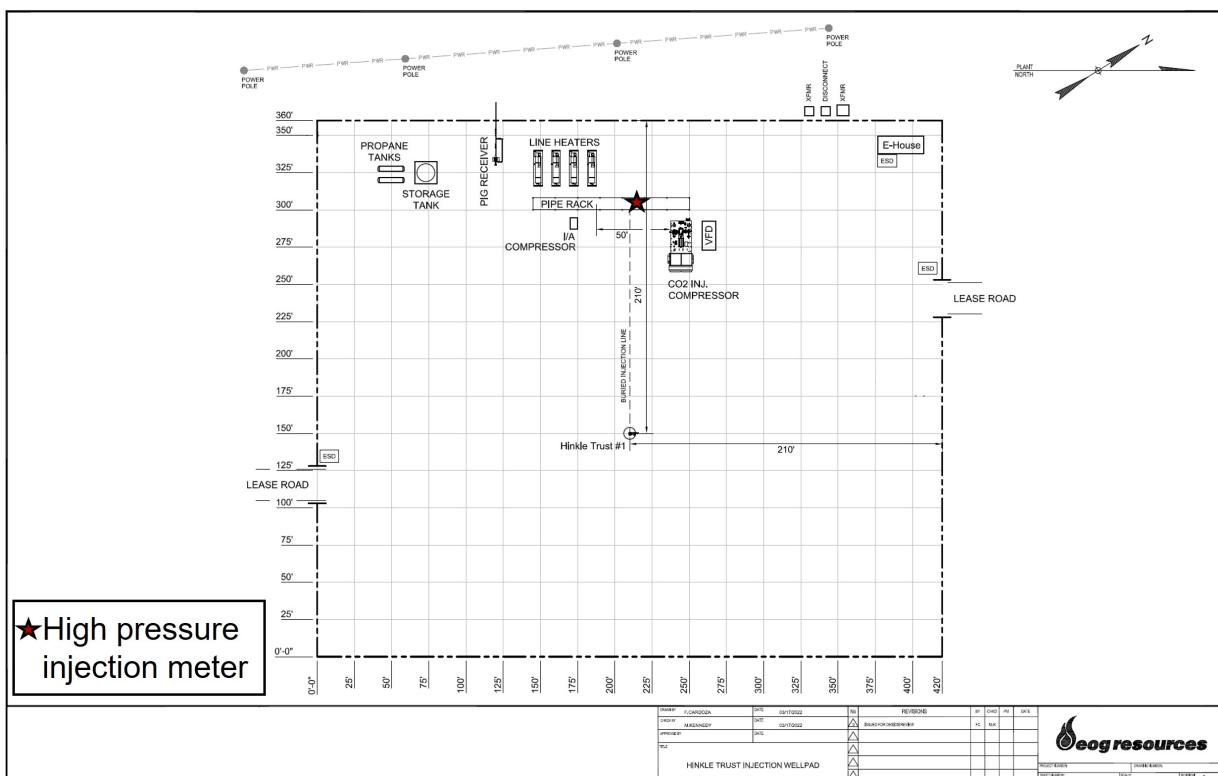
Plot plan for Hinkle Trust #1 injection pad.
